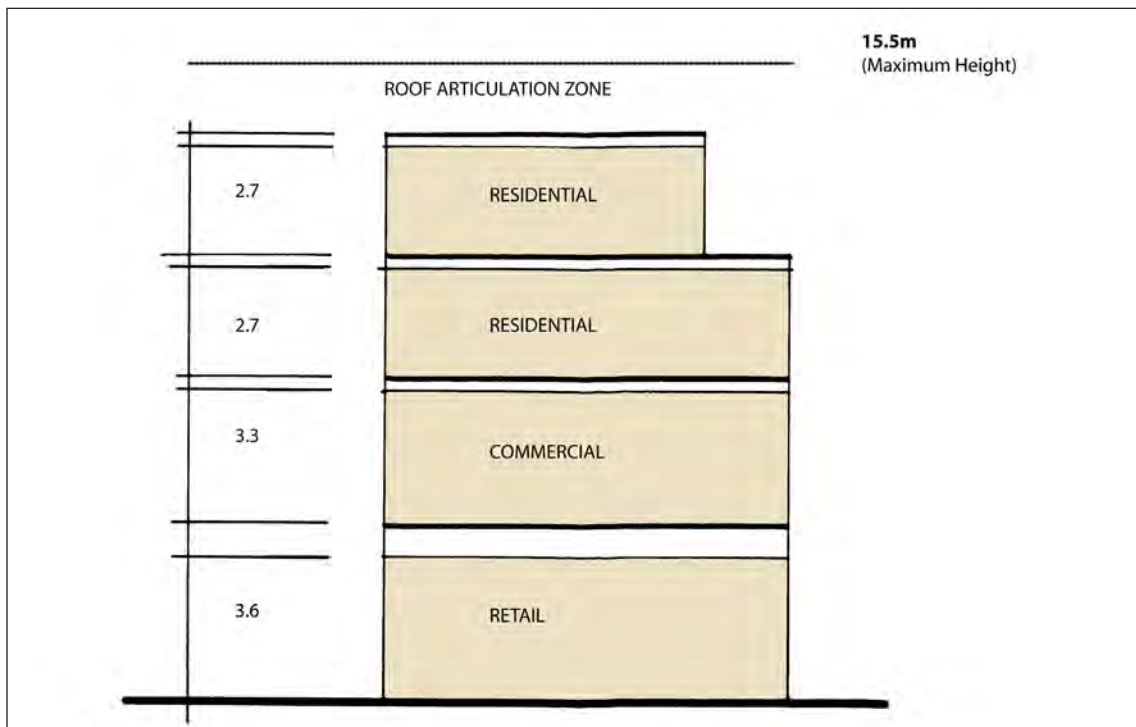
Minimum Floor to Ceiling Heights (Indicative)
